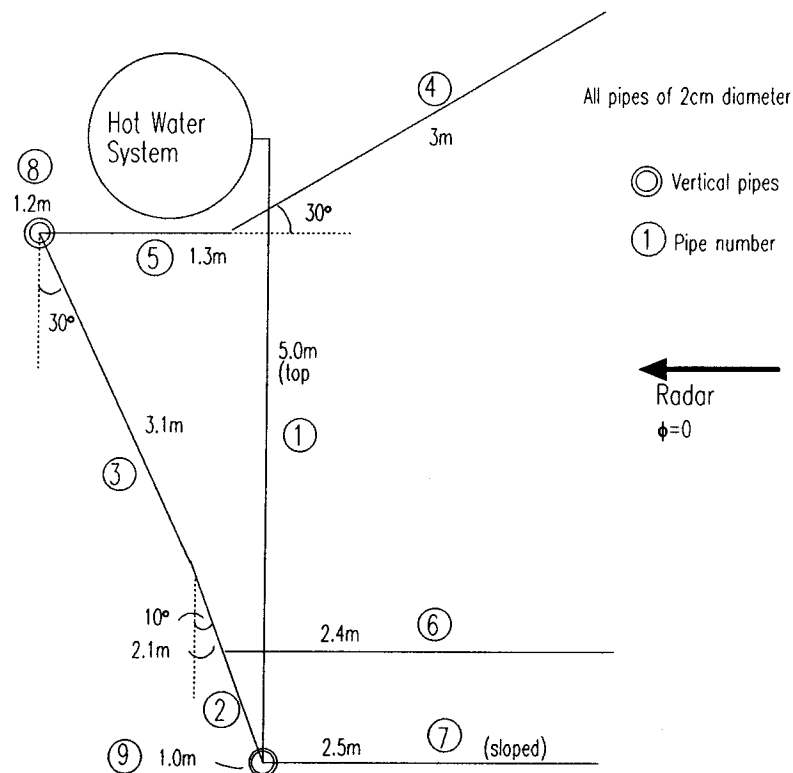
Plan view of the pipe layout from a hot water system in a real residential ceiling.
